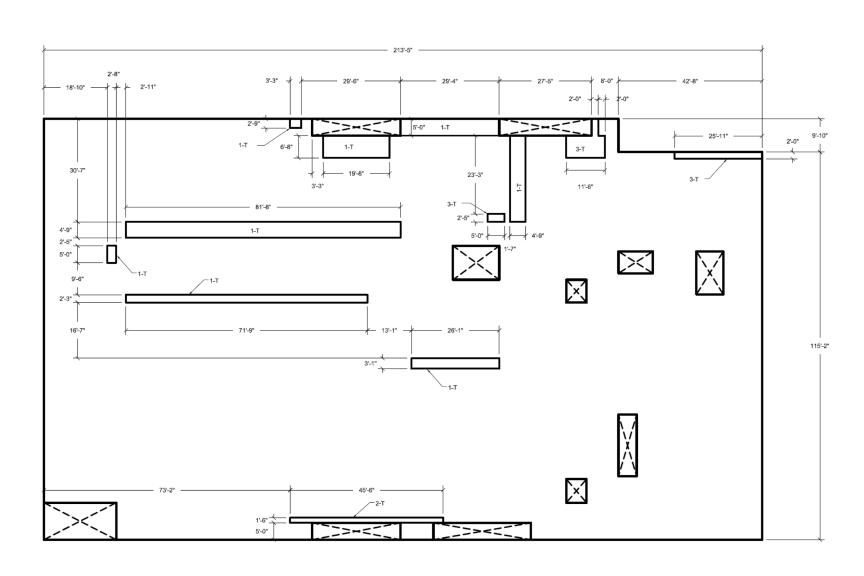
H.3-37a Elevation 35 Looking Down Horizontal Transverse Reinforcement Zones Rev. 07
